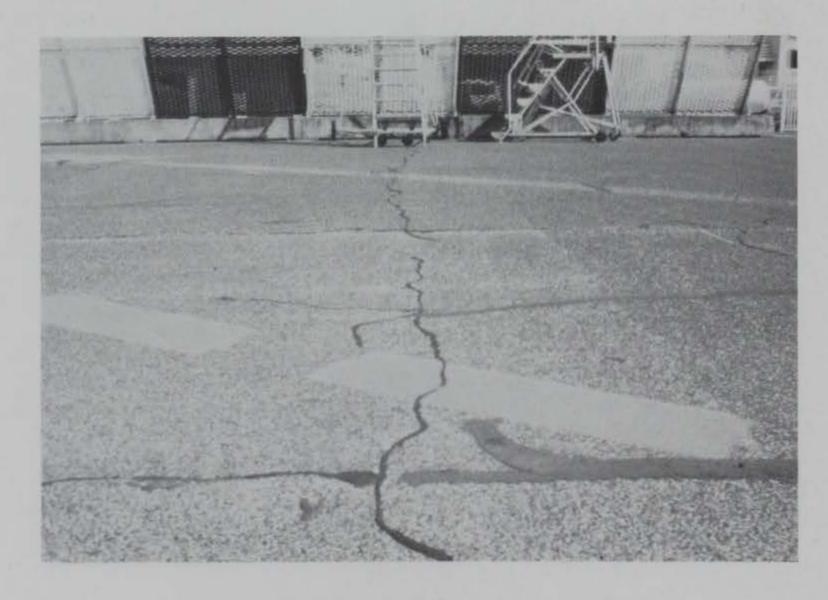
Random reflective cracks in 1976 Salviacim pavement
